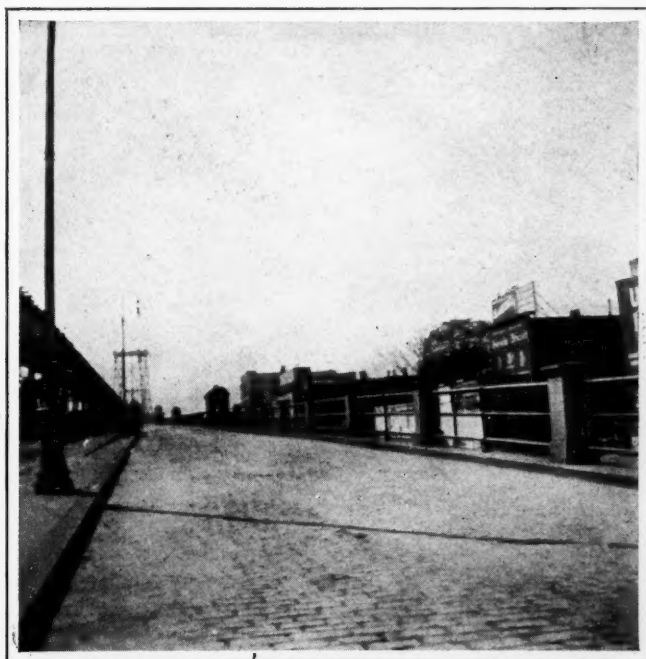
MEDINA SANDSTONE PAVEMENT; APPROACH TO WILLIAMSBURG BRIDGE, BROOKLYN, N. Y.
